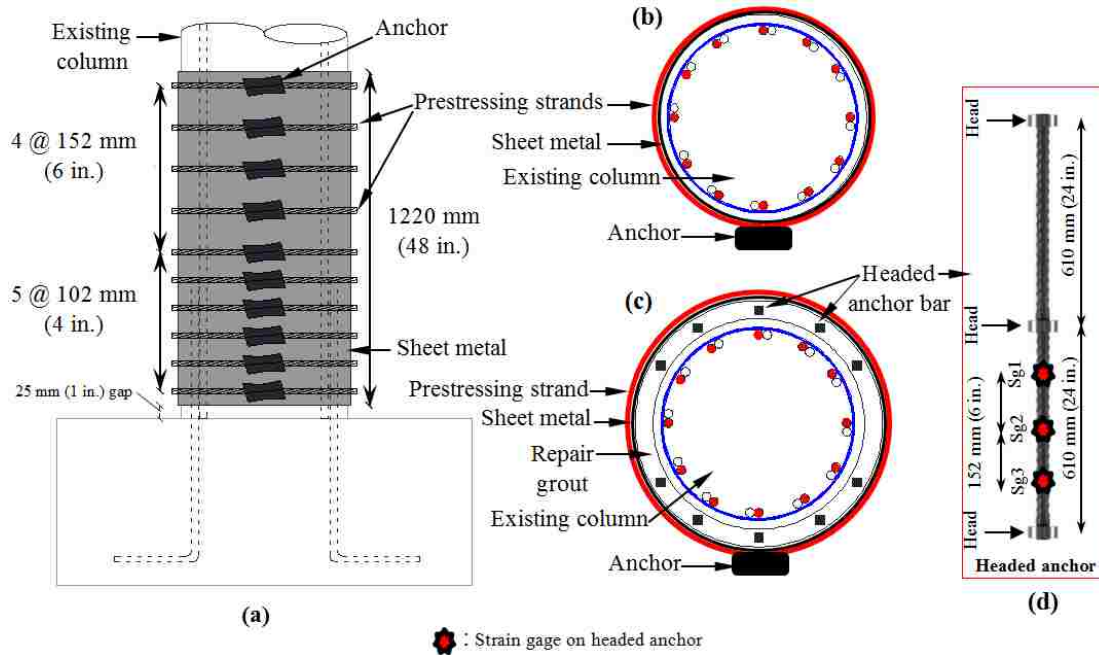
Final design of the PSJ: (a) plastic hinge repair for two damaged columns, (b) cross section of repaired Column 1, (c) cross section of repaired Column 2, and (d) No. 4 (12 mm) headed anchors.
